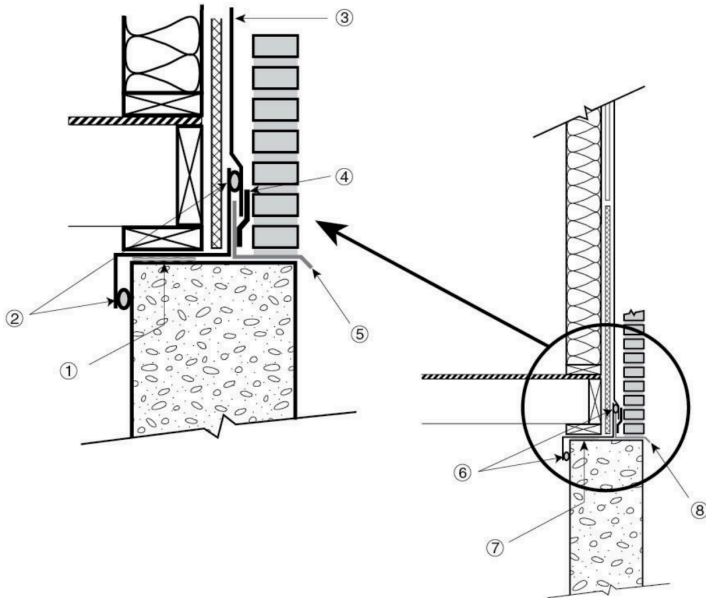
Tyvek® HomeWrap® bottom foundation detail
